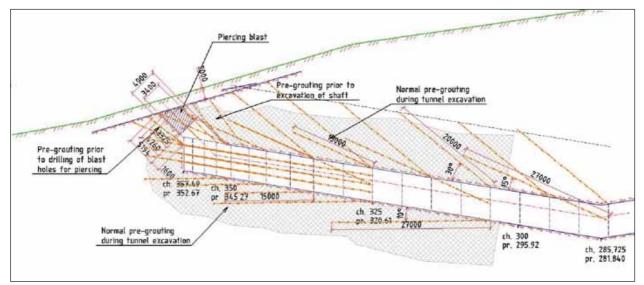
Outlet Tunnel - exploratory drilling programme and rock mass grouting. (Illustration: Norconsult)
